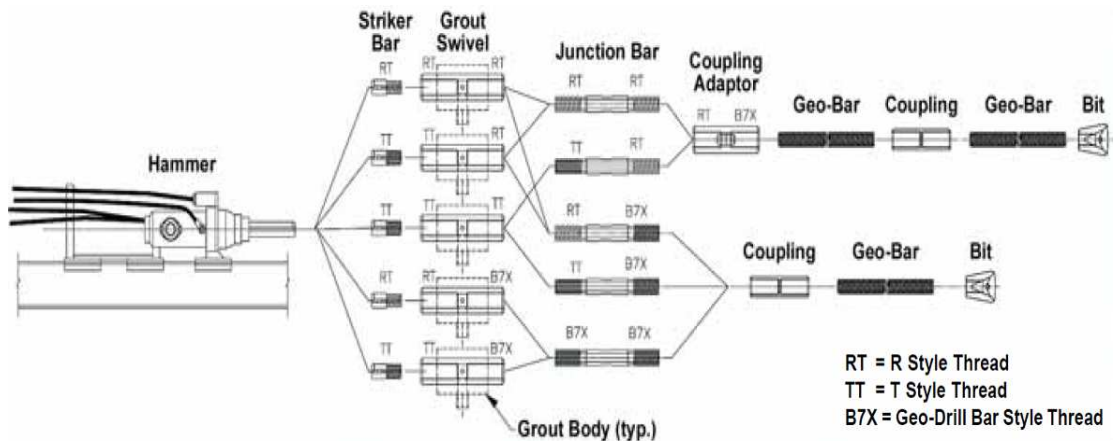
8. All possible connections between the drafter hammer and the hollow bar (after Ground Anchor System 2011)
